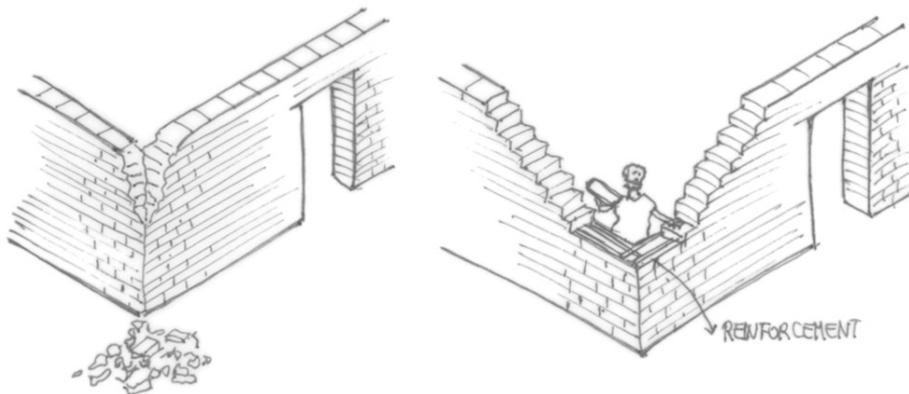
Dismantling and rebuilding collapsed sections in adobe masonry
